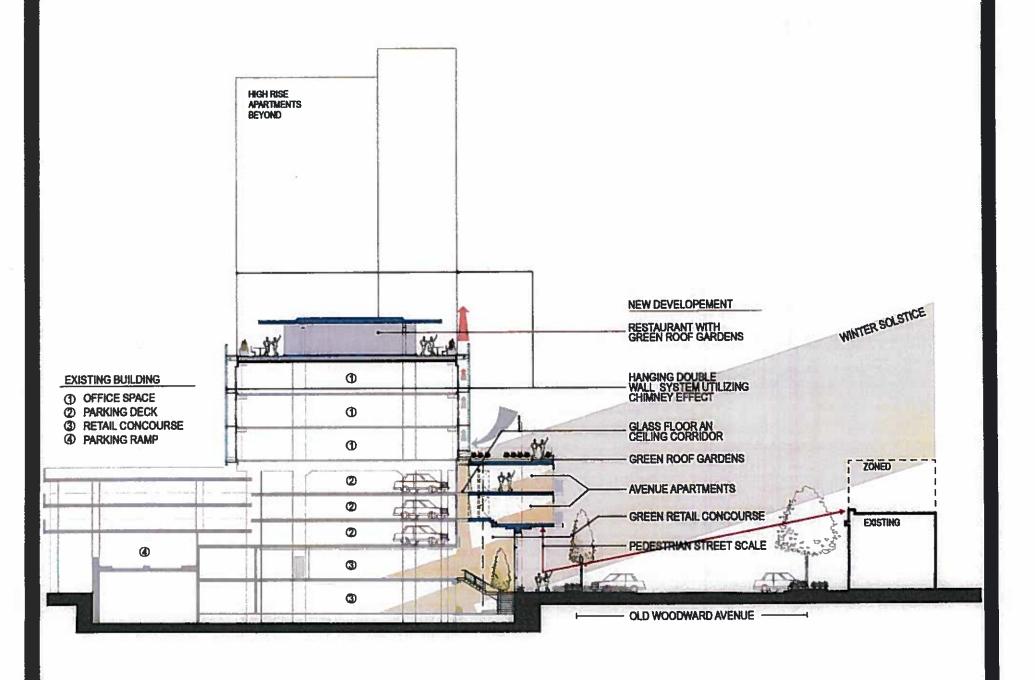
EXHIBIT E - VIEW FROM EAST (Woodward Avenue)
